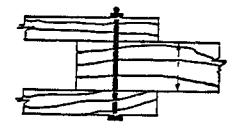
Typical bulkhead, wale outside (AWPI, p. 4)
